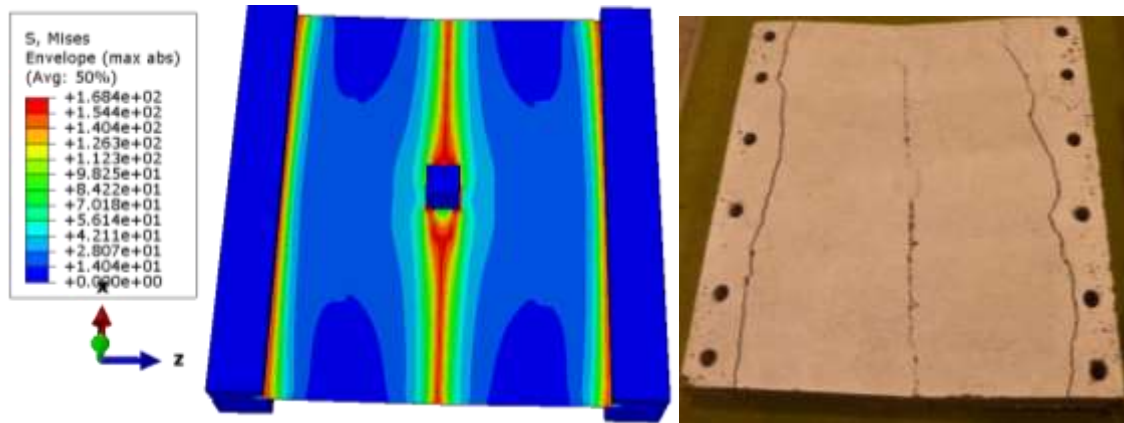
Stress distribution against test failure mode for the 45 mm one-way slab with FF boundary condition.
